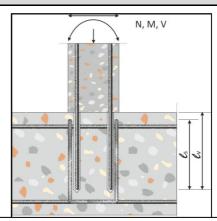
Overlap joint at a foundation of a column or wall where the rebars are stressed in tension
